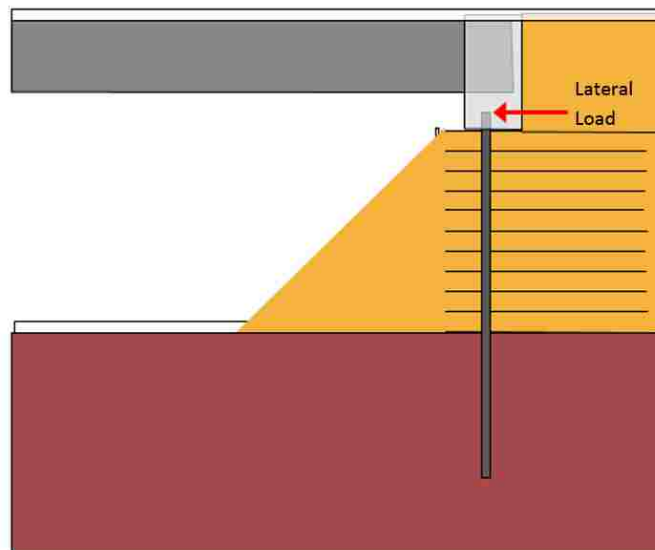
Cross-section of abutment piles behind an MSE wall.
